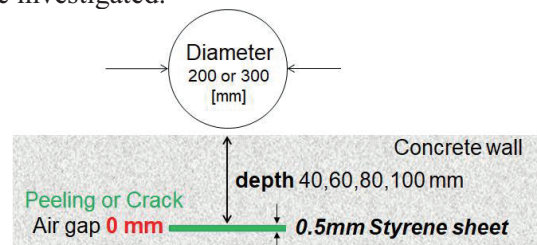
Position and size of a circular peeling defect embedded in concrete wall specimen.
